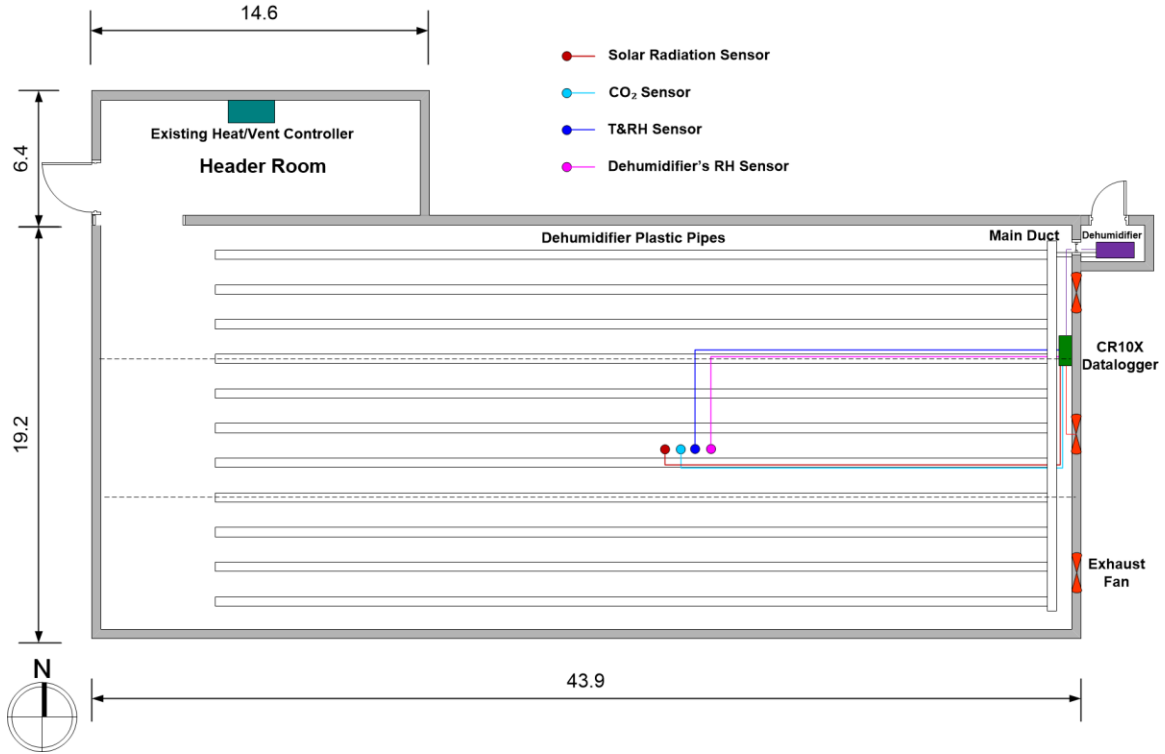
Greenhouse layout and sensor locations (dimensions in m).
